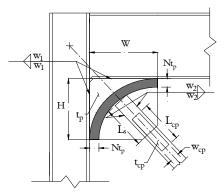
Elliptical Clearance Design Method for Corner Gusset Plates
